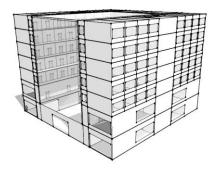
Alternative 2 - model of the building with glazed atrium - the basic atrium type building
